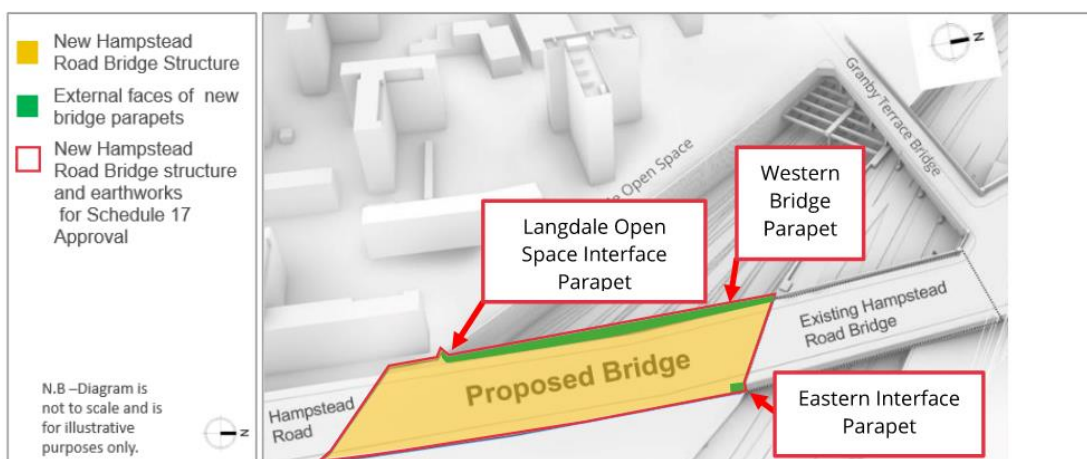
Elements for approval within this Schedule 17 application at highway level. The location of the parapets for approval are shown in green.
